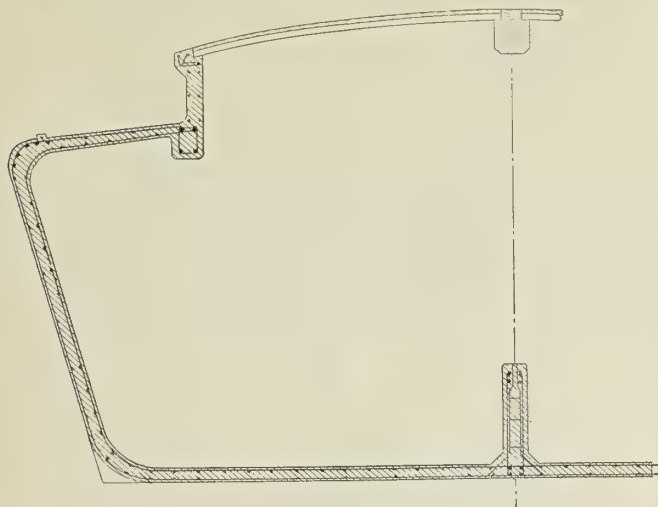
Midship Section of Reinforced Concrete Swim Barge (Wells System)
